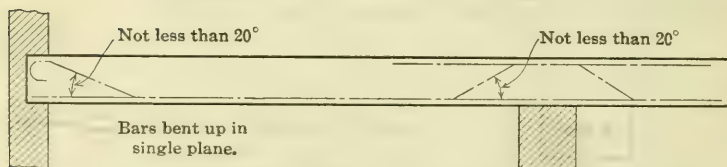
TYPICAL REINFORCED CONCRETE BEAM; PRINCIPAL LONGITUDINAL BARS BENT UP IN SINGLE PLANE.
